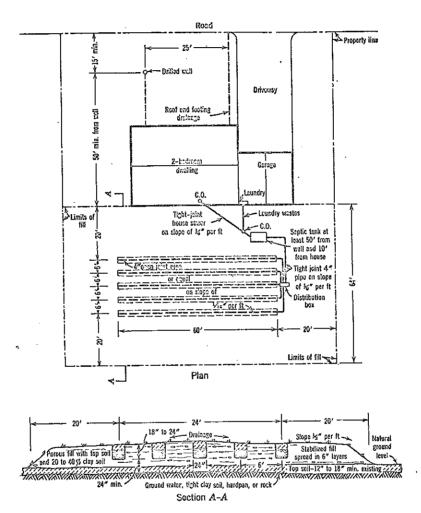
Sewage-disposal system over clay soil or rock. Note: First floor and house sewer elevations must be established to provide gravity flow to sewage disposal system. *Design basis*: 300 gpd and a transvappercolation rate of 0.5 gal per trench sq ft per day or $\pm \frac{1}{3}$ pt per sq ft of gross area of fill (64' × 100').
